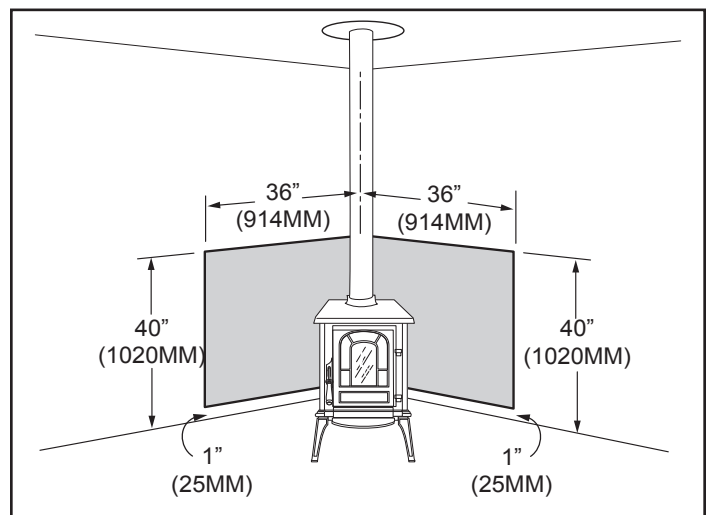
Corner installation, vertical chimney connector, two wall shields.
